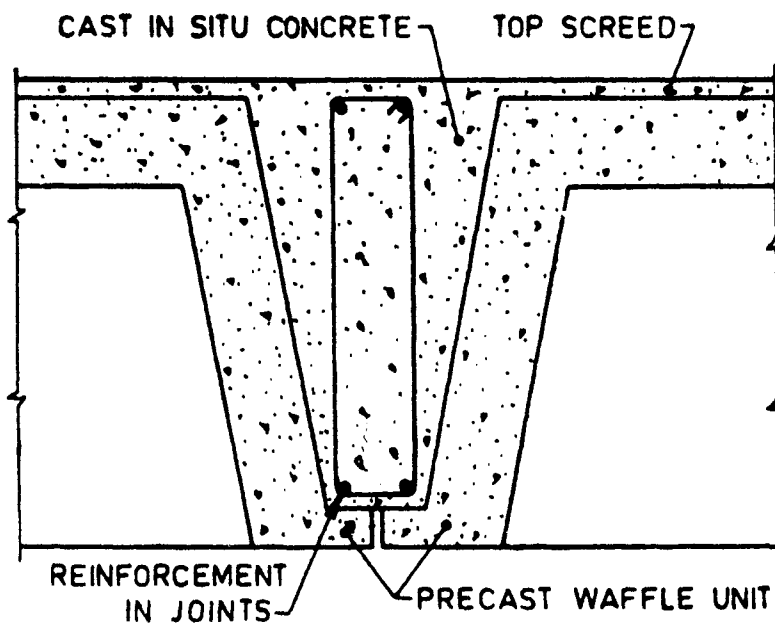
TYPICAL SECTION OF FLOOR USING WAFFLE UNITS
